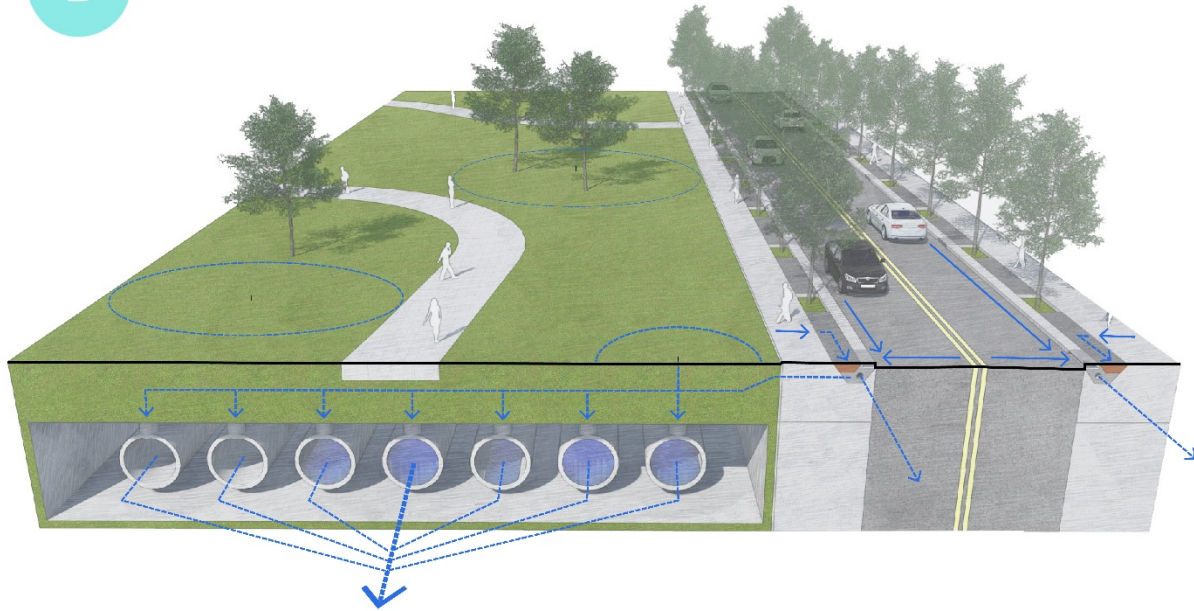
Diagram of Underground Stormwater Storage Cistern
